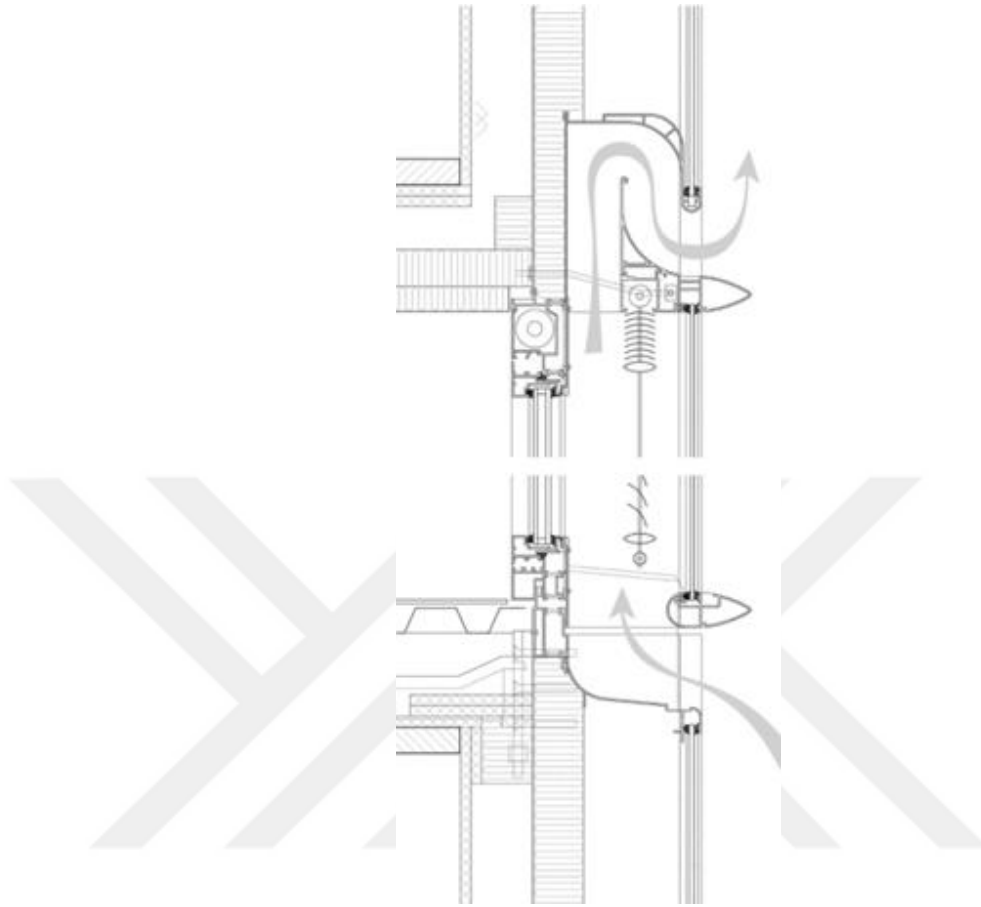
Three layered façade system detail of Commerzbank. (Source: Sev and Aslan, 2014)
